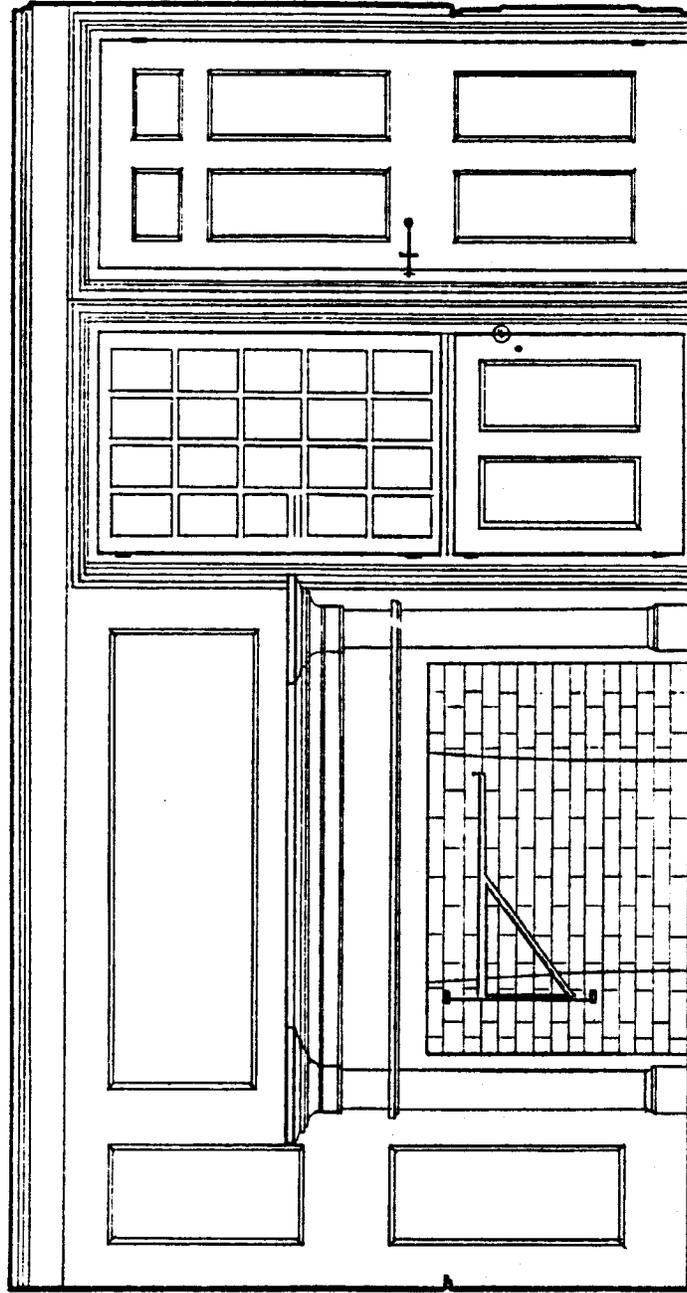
Atwood-Higgins House: West Front Room, East Wall.
